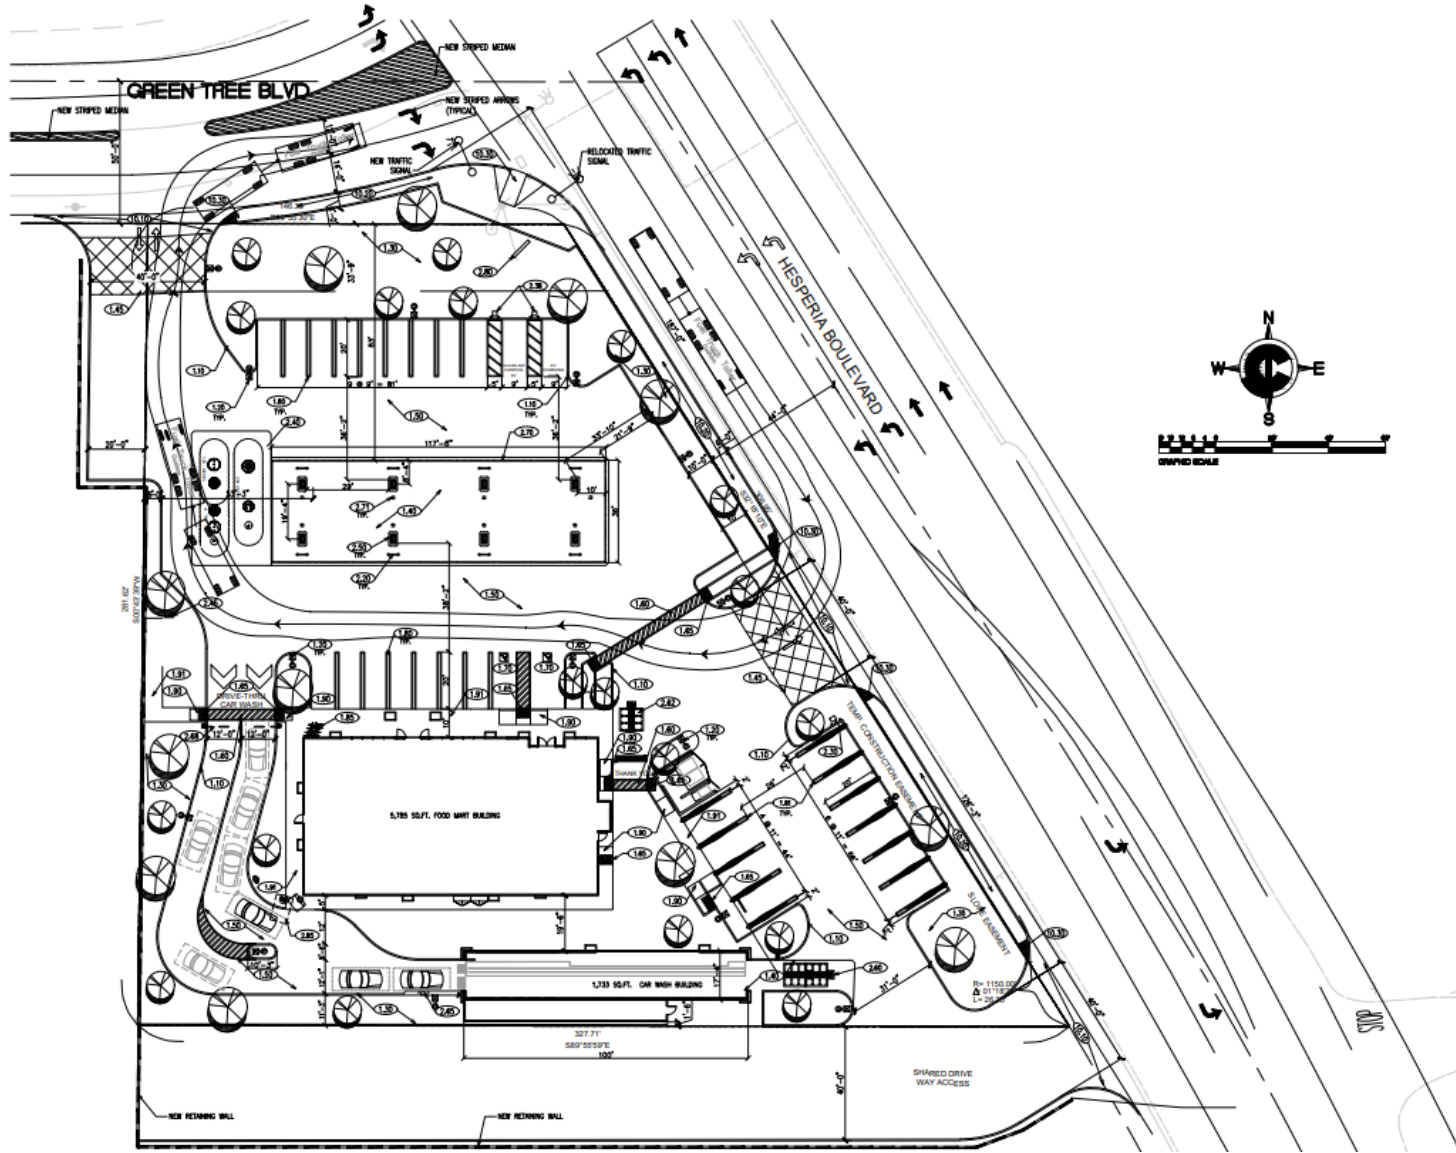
SITE PLAN OF PROJECT SITE
